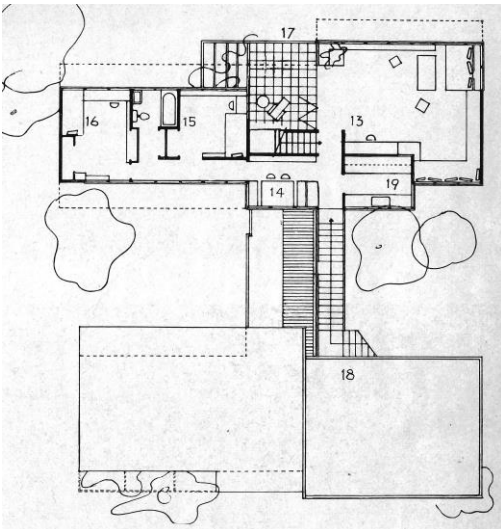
VDL Research House. Second floor plan. (Boesiger, *Buildings & Projects*, 27.)
